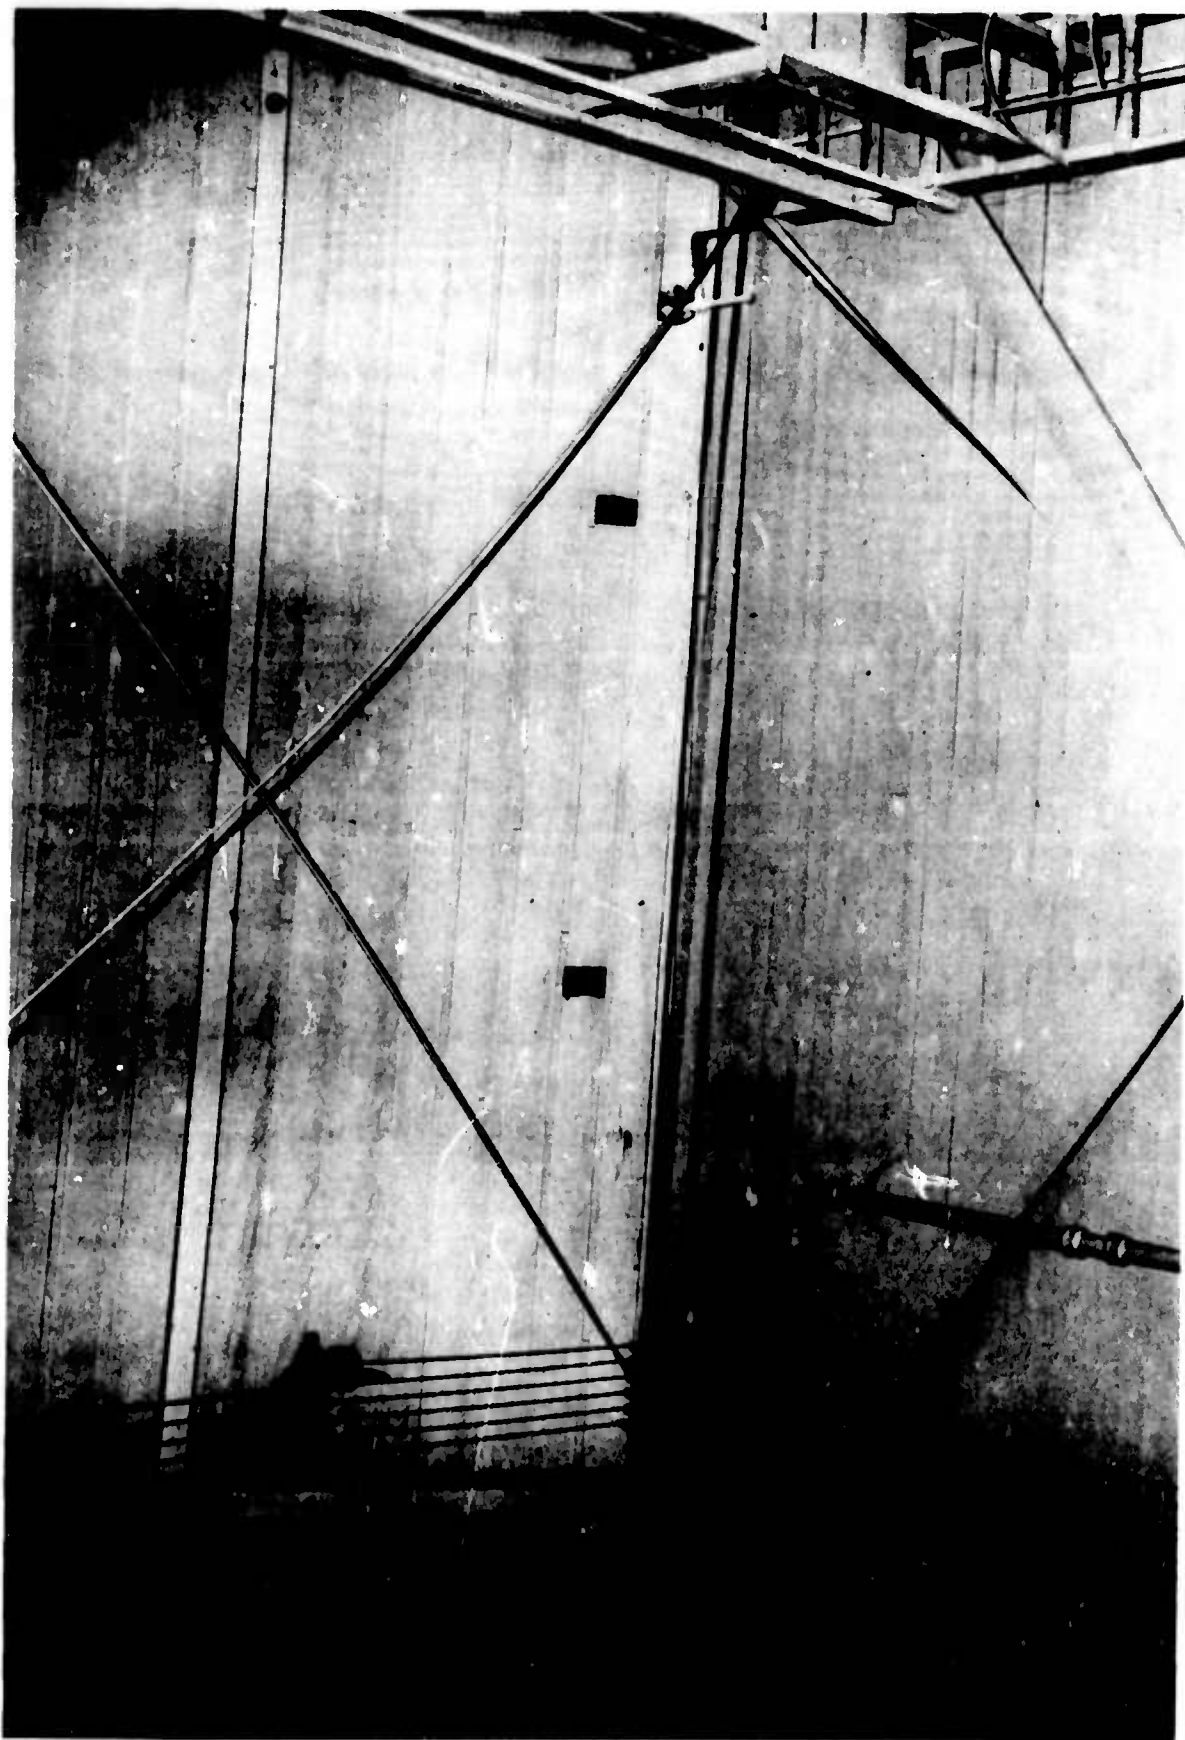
Elmendorf AFB Aircraft Maintenance Hangars (Split truss tie-rod anchor plate)
